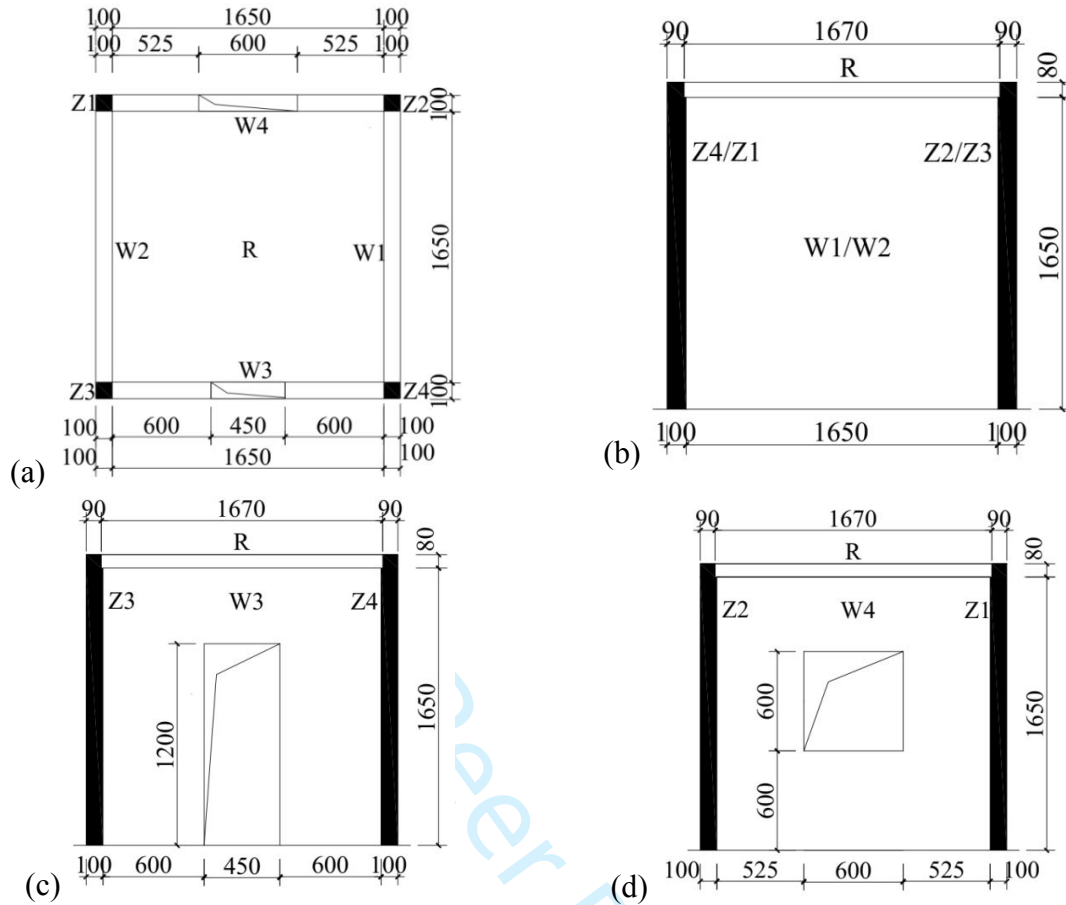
Floor layout and cross-sectional view of the test specimen:(a) Plane figure,(b) Side elevation,(c) Front elevation and (d) Back elevation
